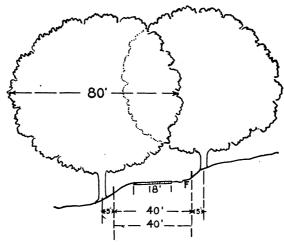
A 40-foot right of way with an 18-foot improved section and a narrow footpath (F). Because of the limited room the shade trees must be planted at the edge of or outside the right-of-way.
